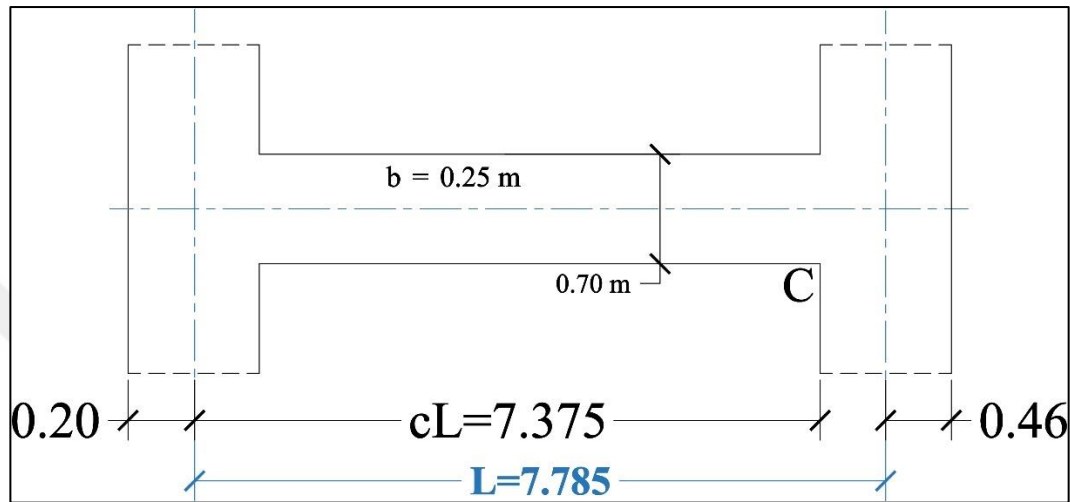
Coupled Beams Connected Between Equivalent Core Wall and Column (X-Dir.).
